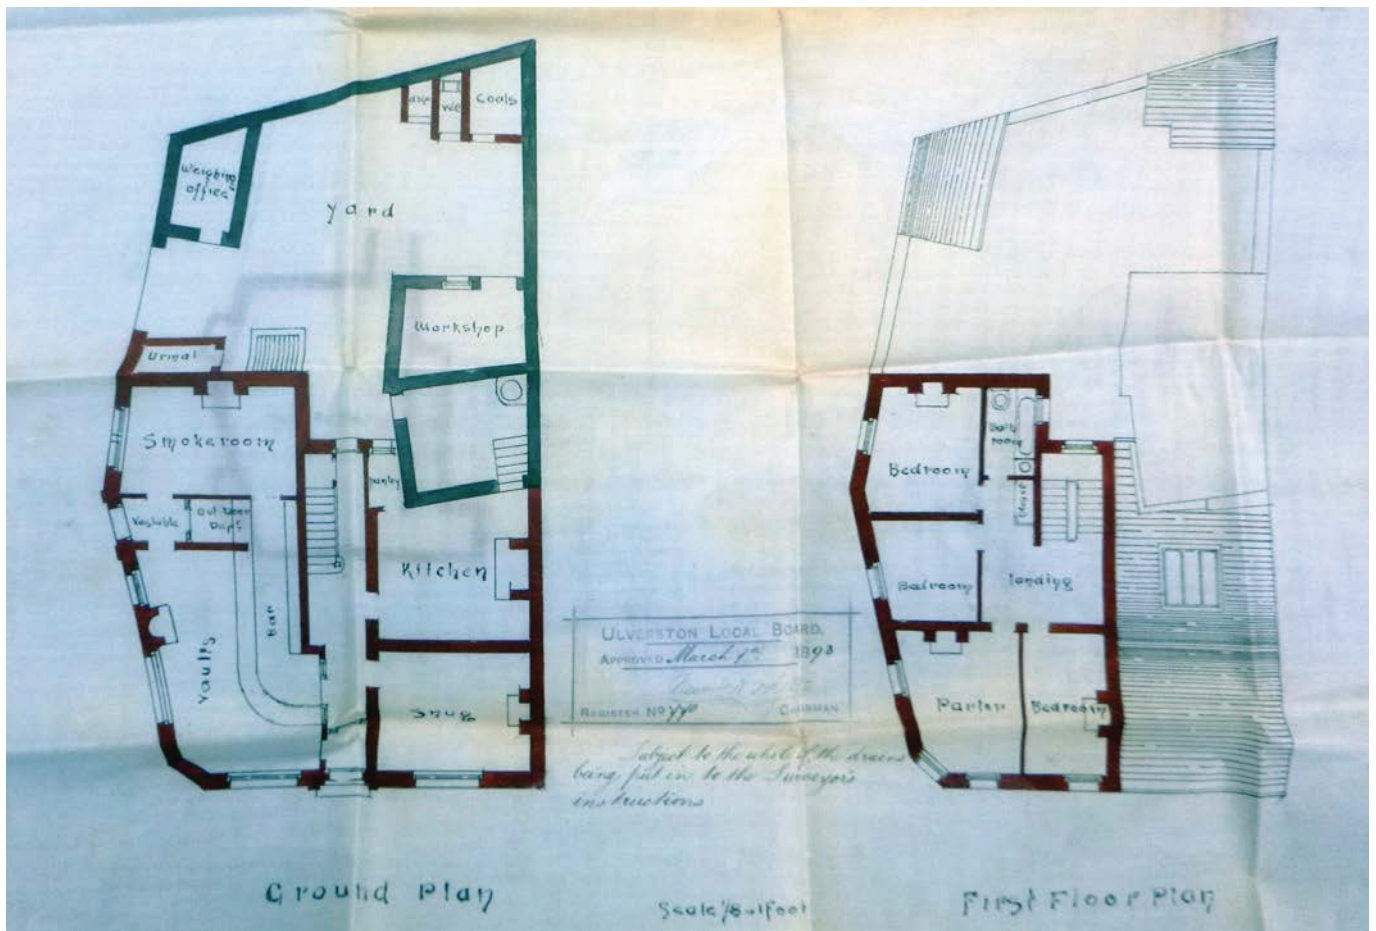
Ground and first floor plans of proposed alterations, 1893 (north is to the left)
